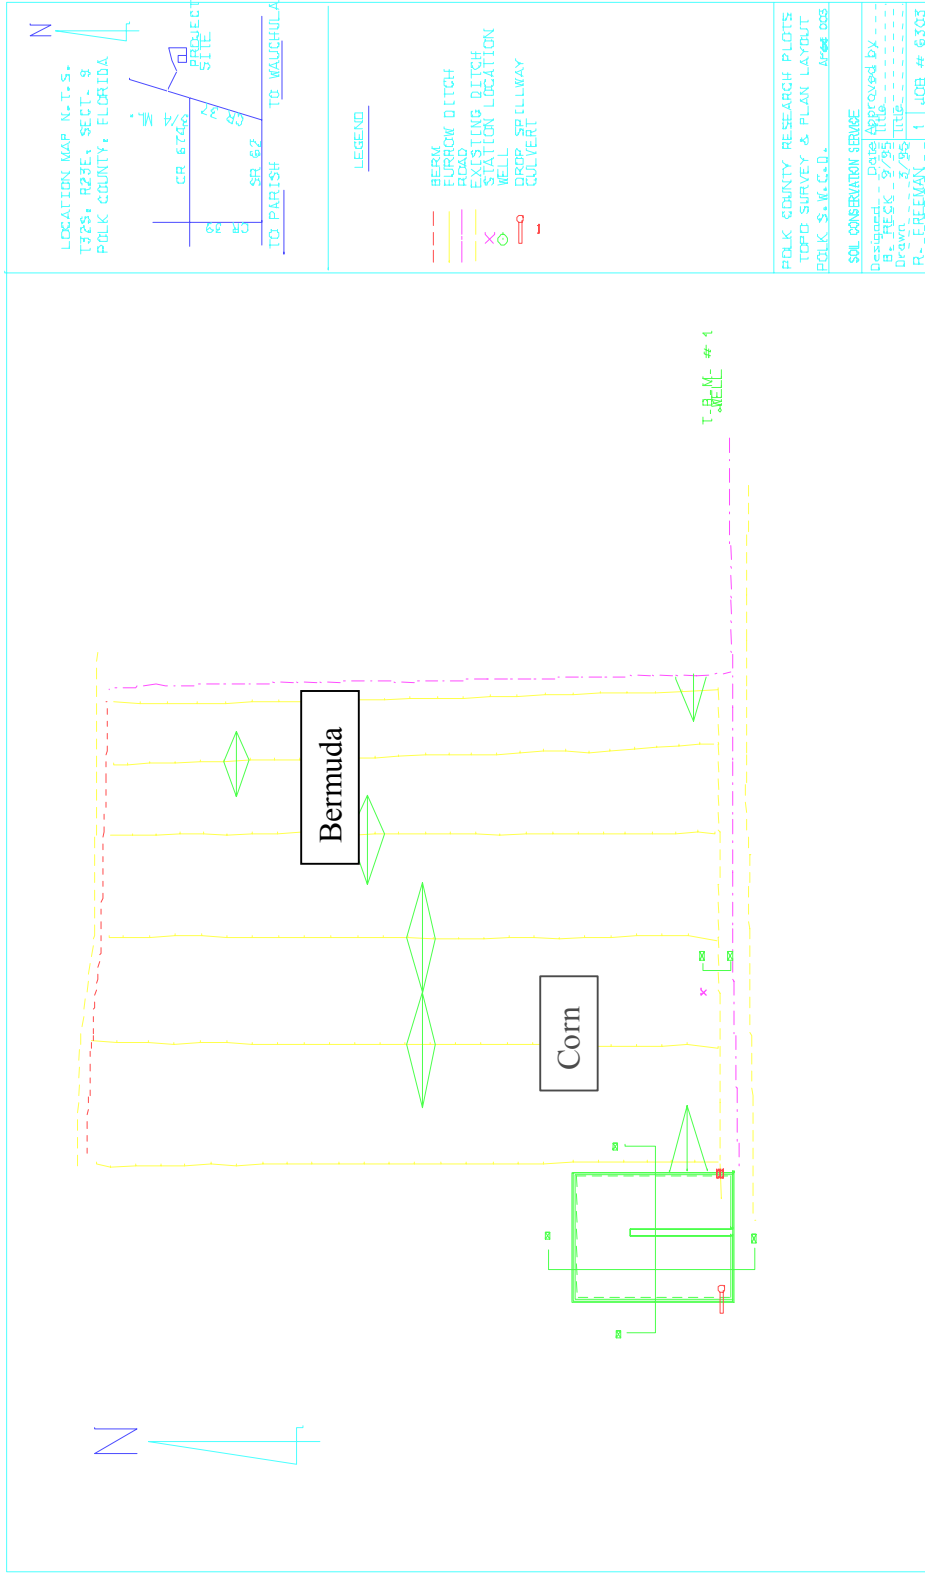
Layout of Macrobeds and Pond, Ft. Green Site.
